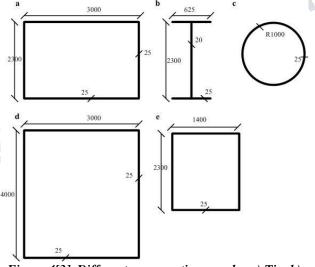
[3]. Different cross-sections used : a) Tie; b) Stringer; c) Arch; d) Arch bracing; e) Cross girder.
